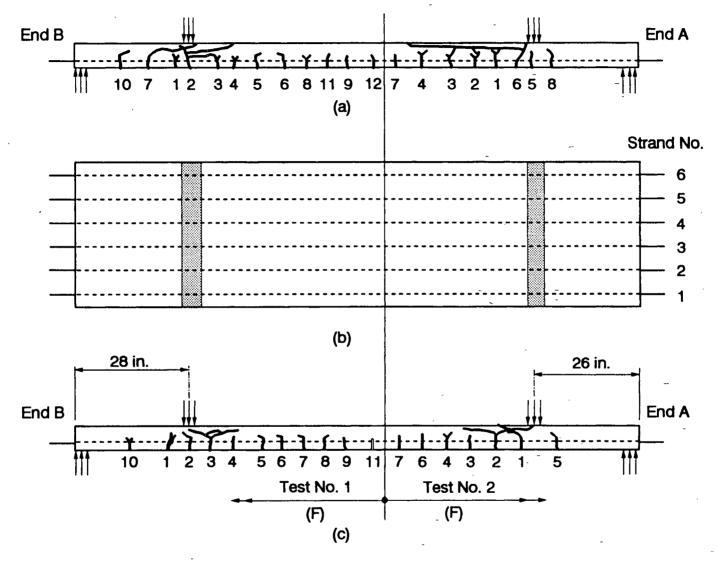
Crack patterns for D-type Specimen No. 8-6.0DC-1:
